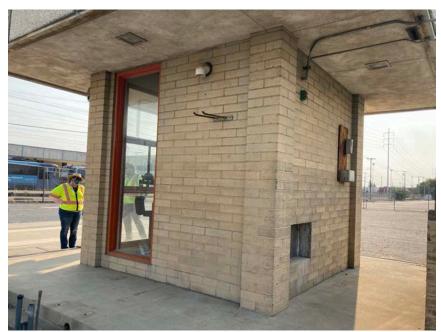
Western and southern façades. Facing northeast. Photo taken 8/17/2021
